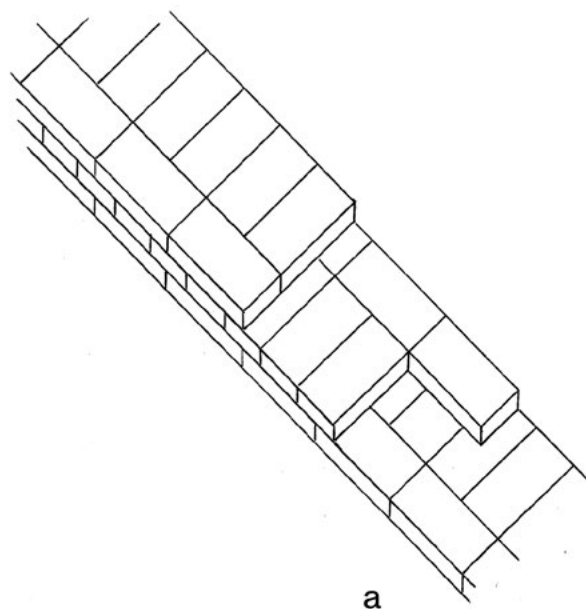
Alternative system for a wall with dimensions like Maussoleion *peribolos* foundation (drawing: P. Pedersen).
